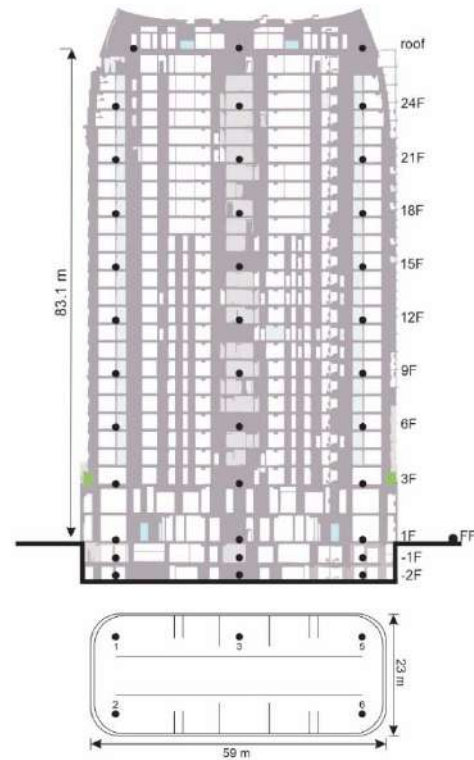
The elevation and floor plan with measurement points in a newly constructed T1 building. (● - Measurement points)
